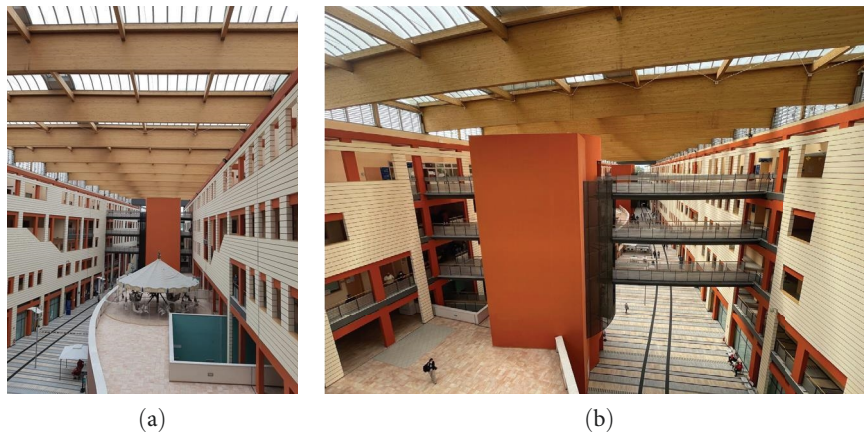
Inside view of the Cardinal Massaia hospital: wooden beams (a) and walkway (b) connecting the blocks K, L, M, and N to blocks D, E, F, G, and H.
